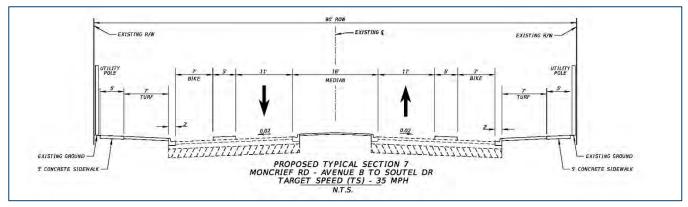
Proposed Typical Section (Avenue B to Soutel Drive)
